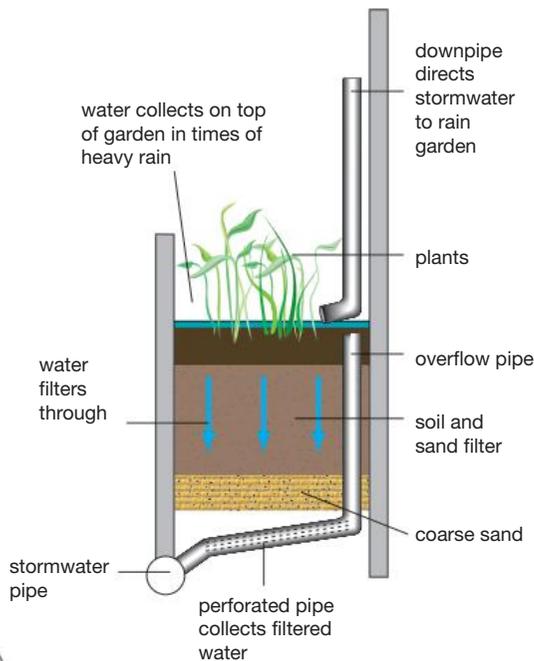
A rain garden cleans stormwater before it enters creeks and rivers.
